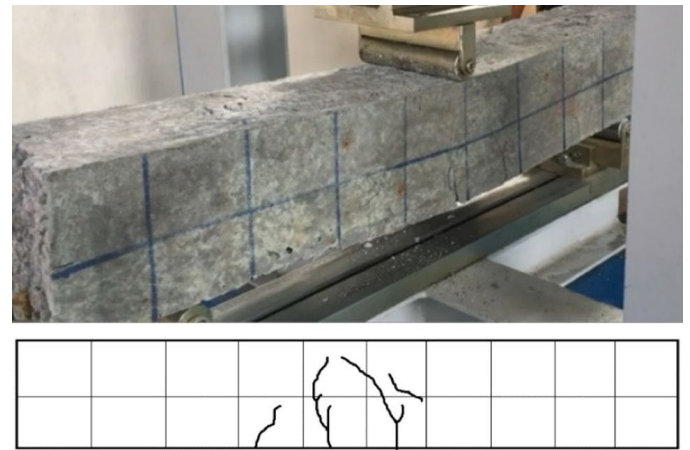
Reinforced concrete beam's crack pattern with 10% POFA and 10% EPS
